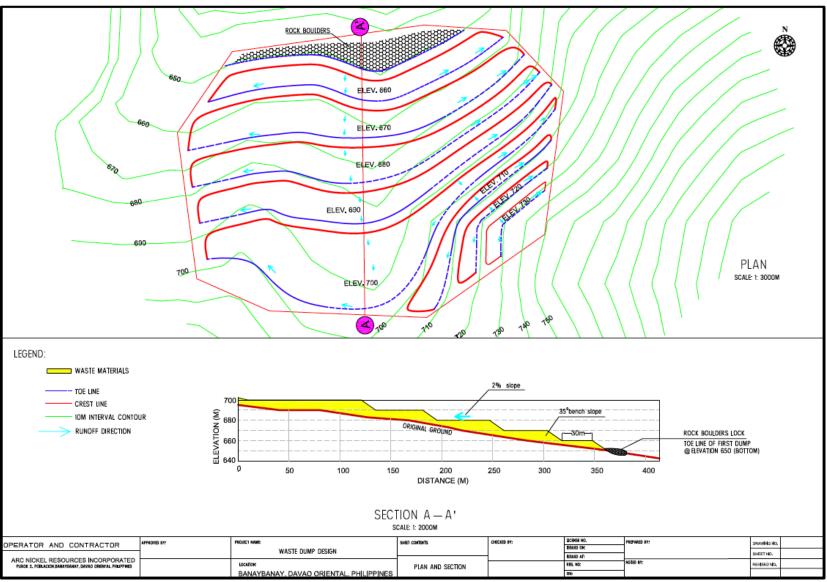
Waste Dump Layout Plan (Source: RCMC)
